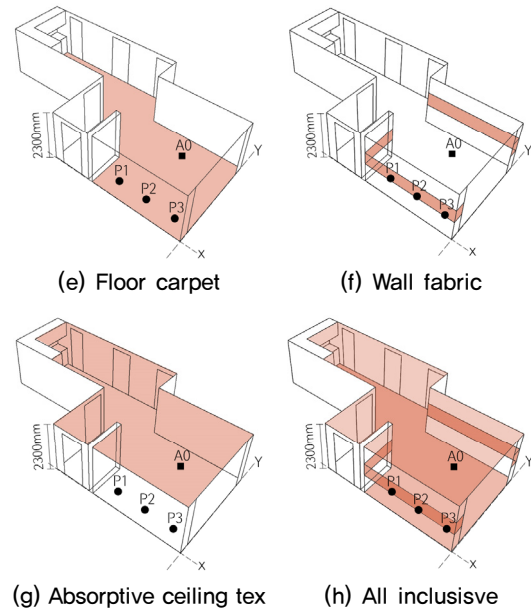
(Color available online) Absorptive wall and ceiling plan for shorter reverberation times.
